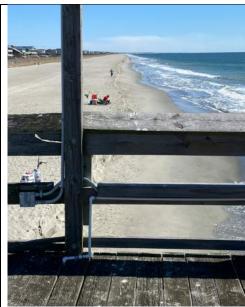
Top Rail Split and Conduit Running along Midrails near station 2+75
